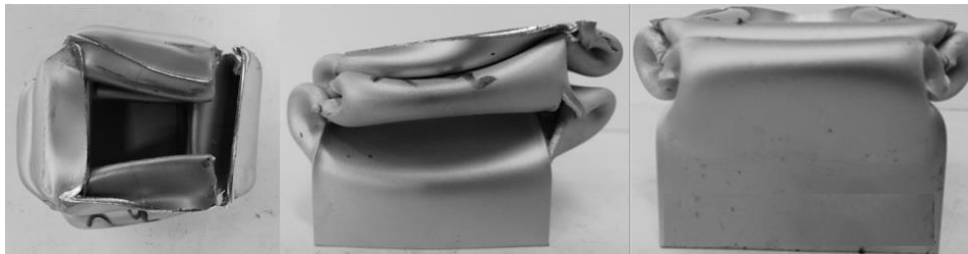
Final views of crushed specimen in test 2a under contact in edge
